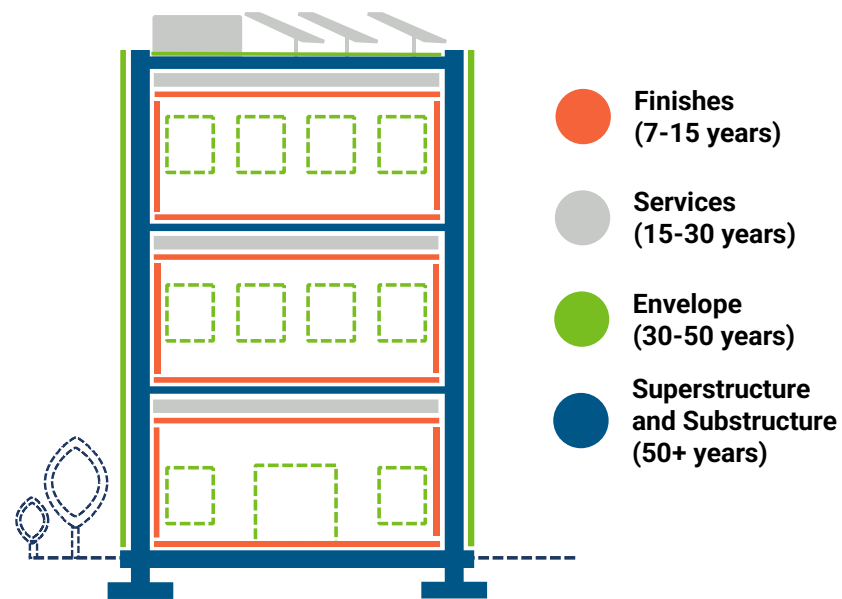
Building elements and their typical lifespan (source: Adapted from Brand, S., 1994, How Buildings Learn: What Happens After They're Built)
